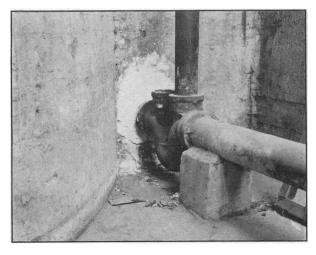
SHOWING PROPER REPAIR OF A DEFECTIVE WALL SURROUNDING SEWER PIPE ENTERING BASEMENT.
